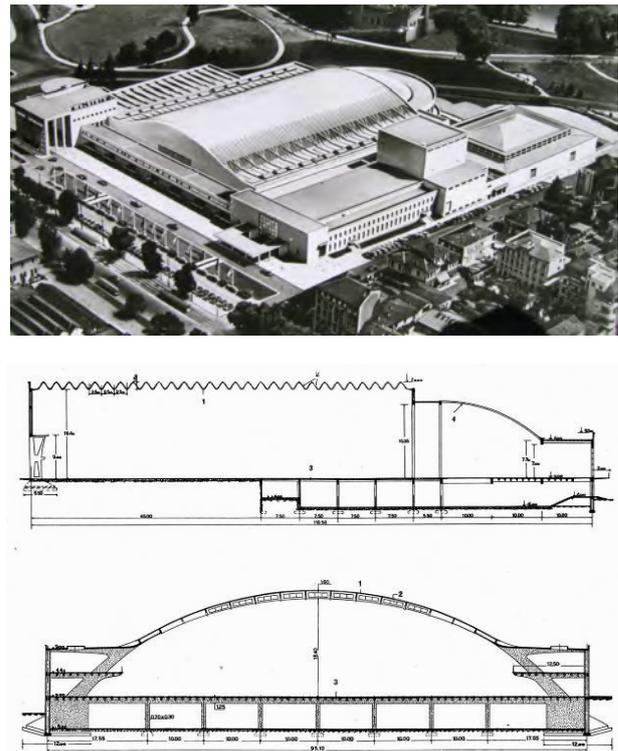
Turin Exhibition Center: aerial view of Hall B (1947-1948) and Hall C (1950) at right corner; longitudinal and transversal sections of the Hall C
